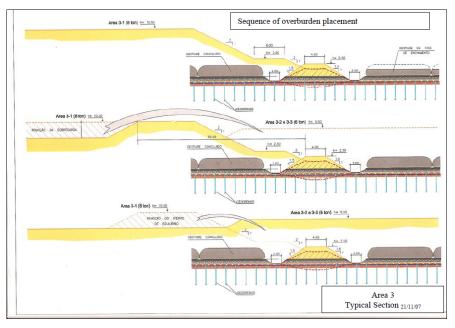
Sketch. Geotextile tube overburden placement sequence (Stephens & Melo, 2013).
